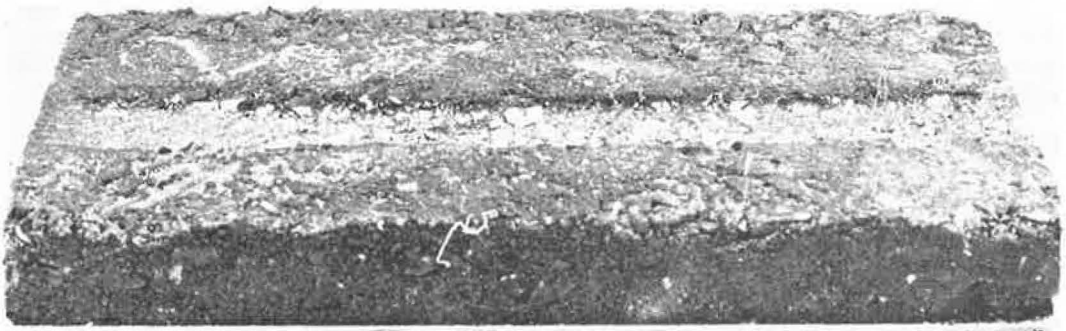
Wheel test specimen (60 C, 3,000 cycles).
